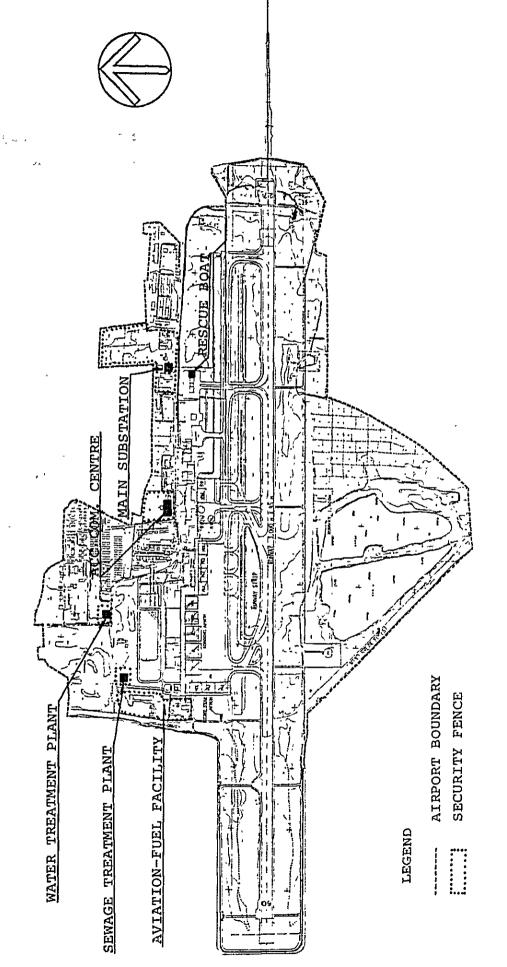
LAYOUT PLAN OF FUNDAMENTAL CLASSIFIED FACILITIES
